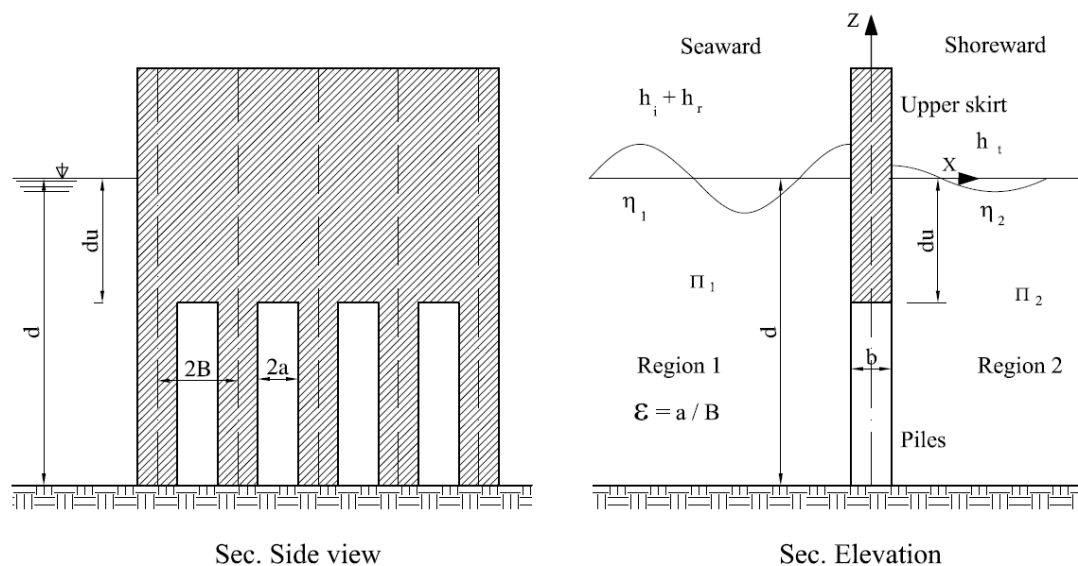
Pile supported vertical wall breakwater. [71 - Suh, 2006]
